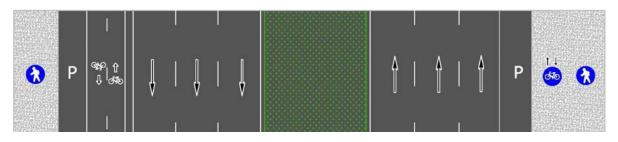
H: Old Colony Avenue Alternative A.2 Cross Section
